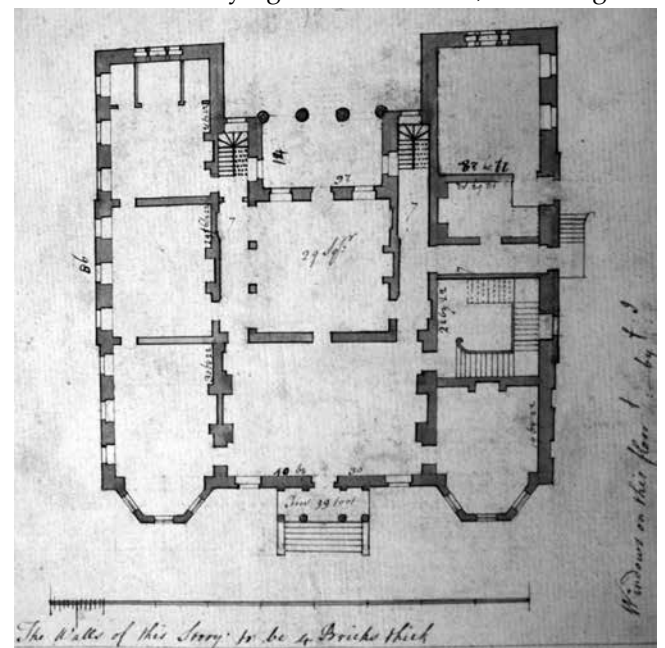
Ground Floor Plan of Edmund Bramston 1752
